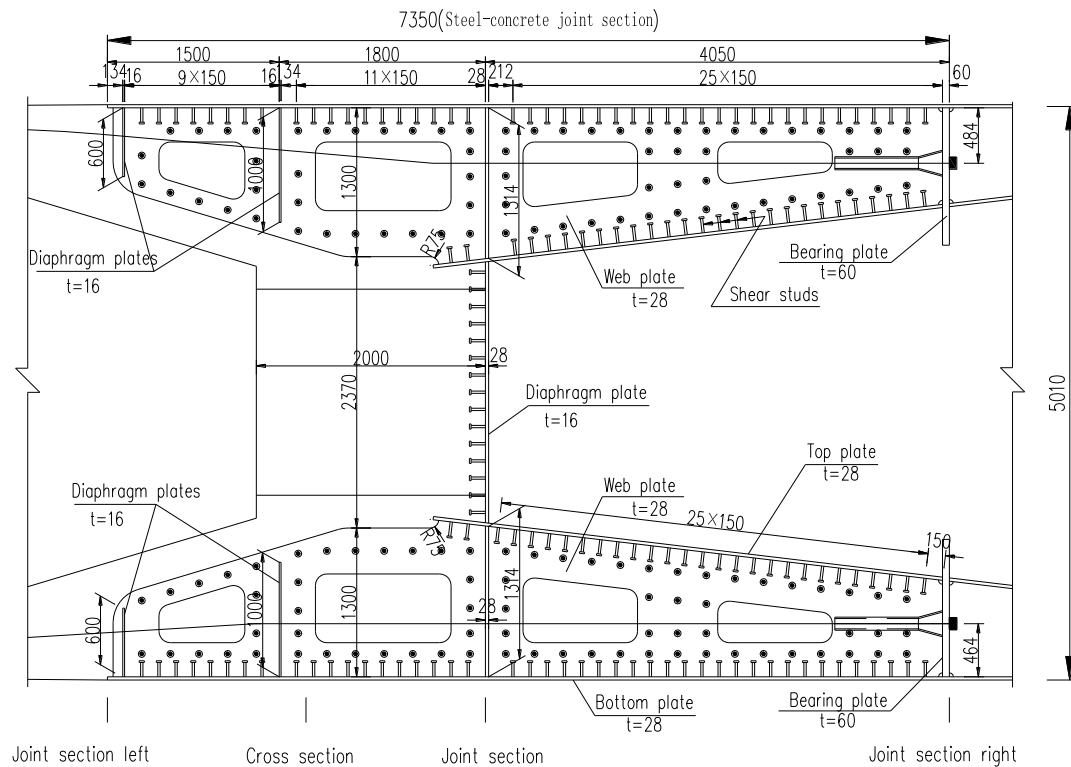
Cross-sectional view of the steel-concrete joint section in the Yong-Jiang Bridge (unit: mm)
